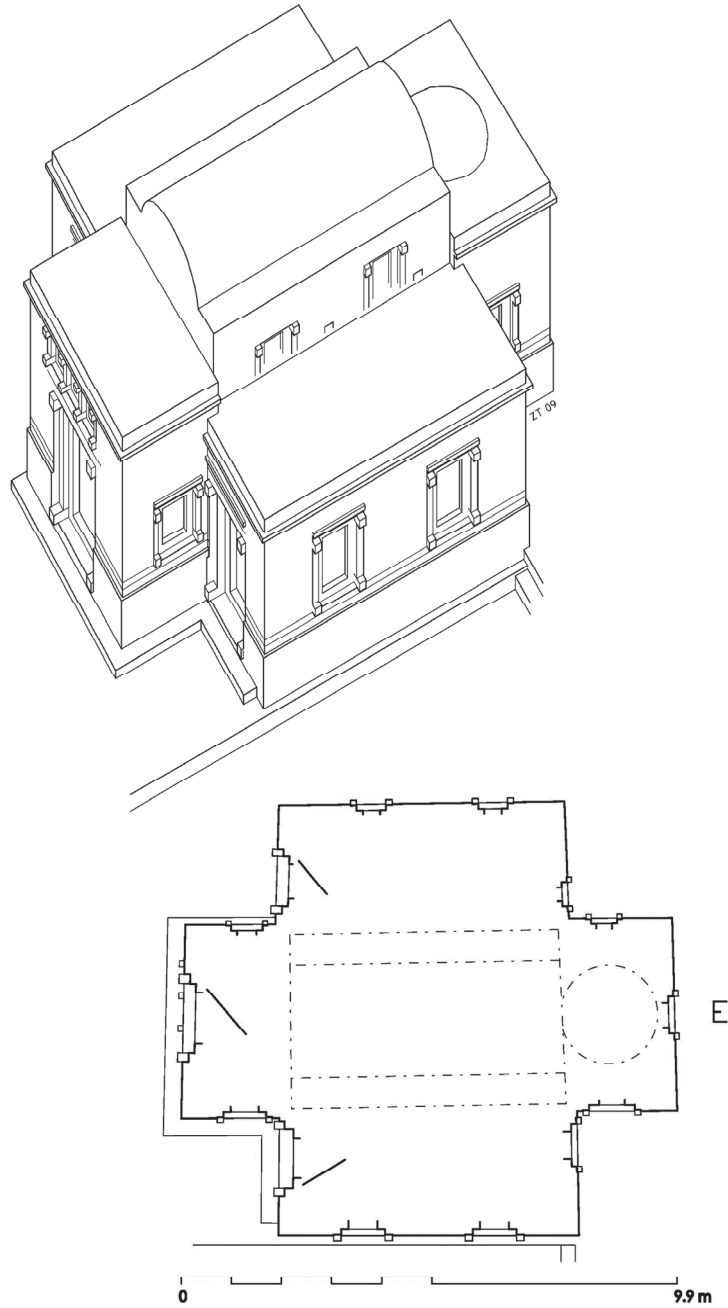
Church of Žämmädu Maryam, Wällo; isometric drawing and floor plan by Zara Thiessen
